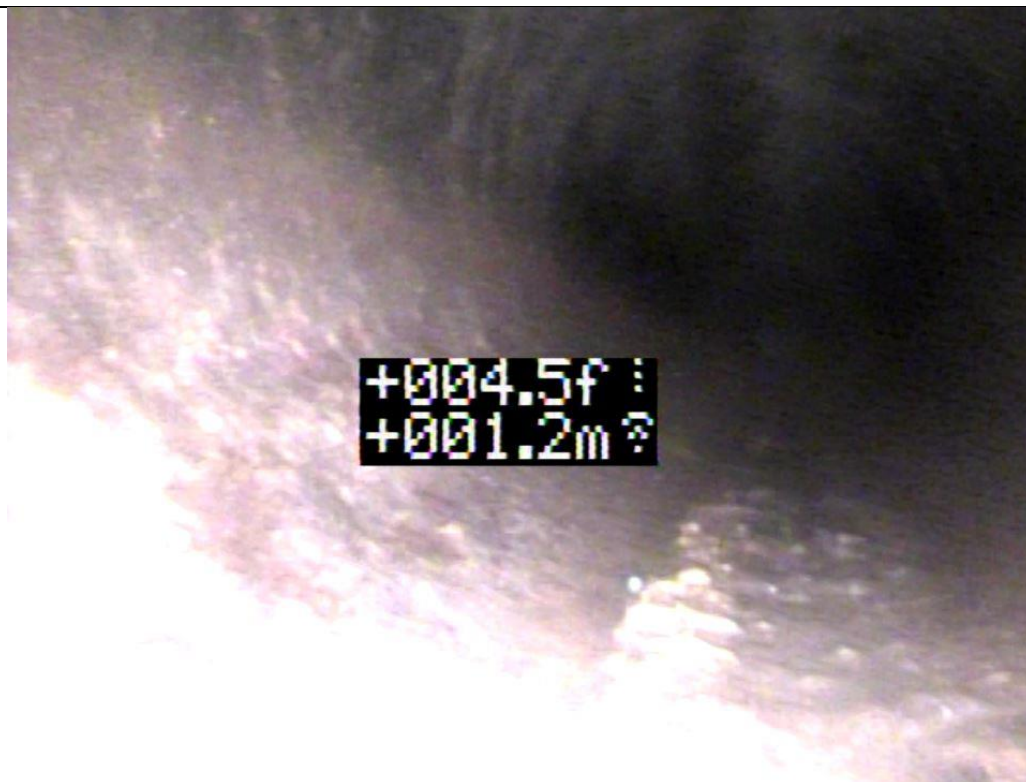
View of the piping associated with the western catch basin behind the drycleaner with no observed cracks, facing east.
